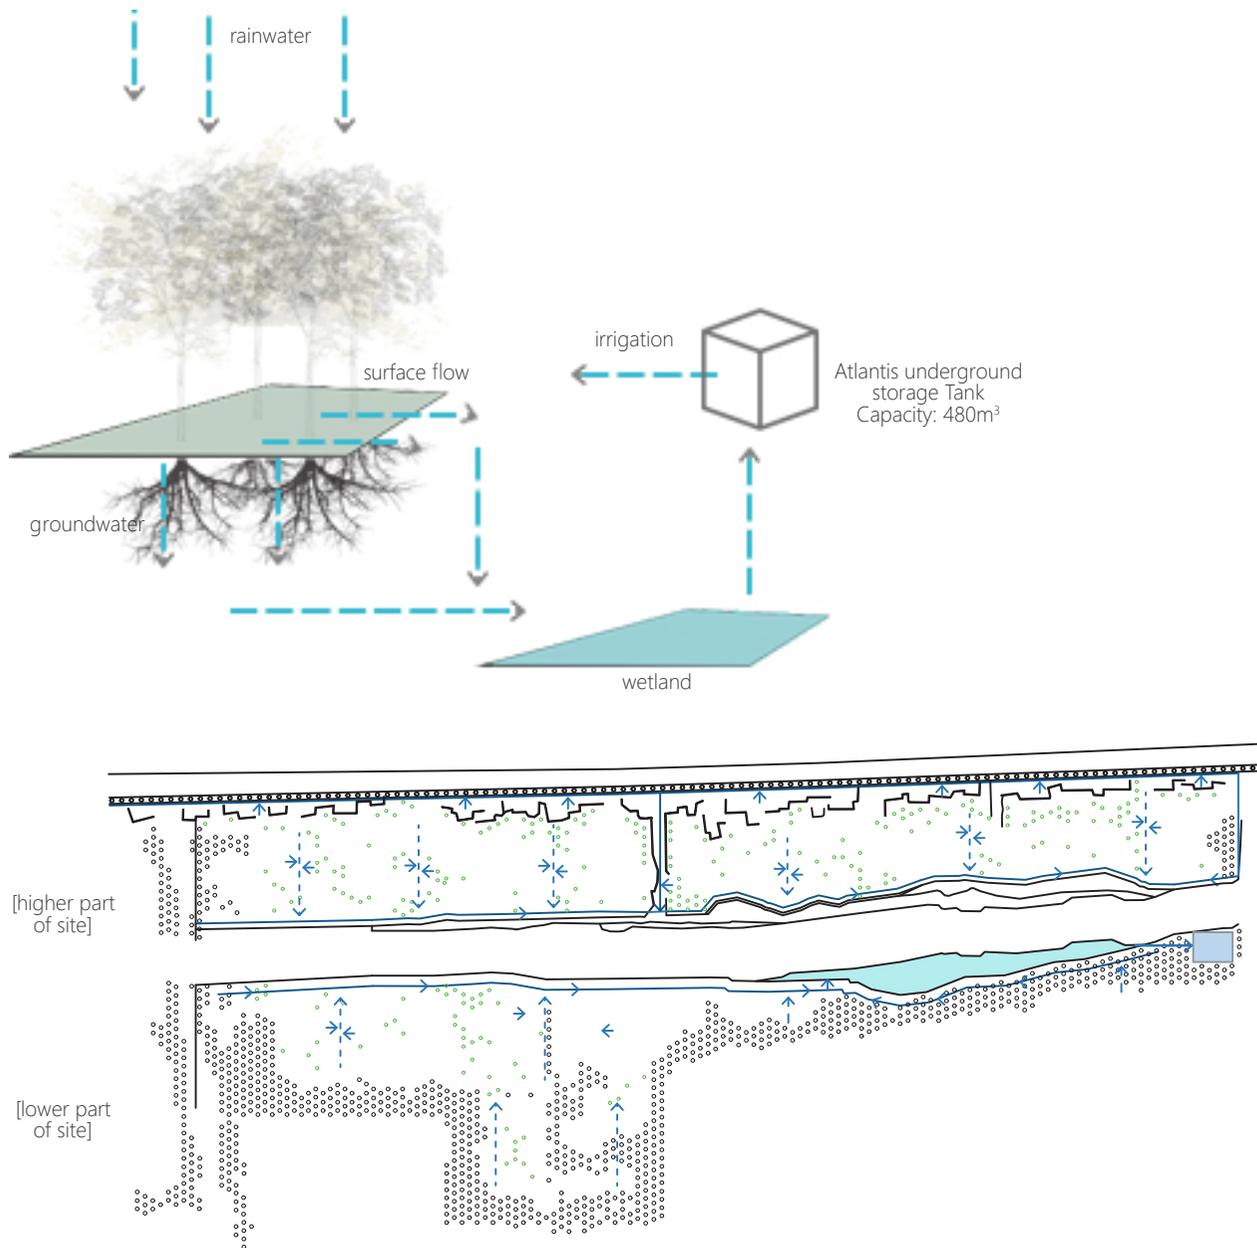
(Author 2018) Stormwater leaching system, System on site plan. Water collected into sub-surface drains (agricultural drains, shallow trenches, and pipes to enter wetland, pass through silt trap, and then be stored in underground tank.
